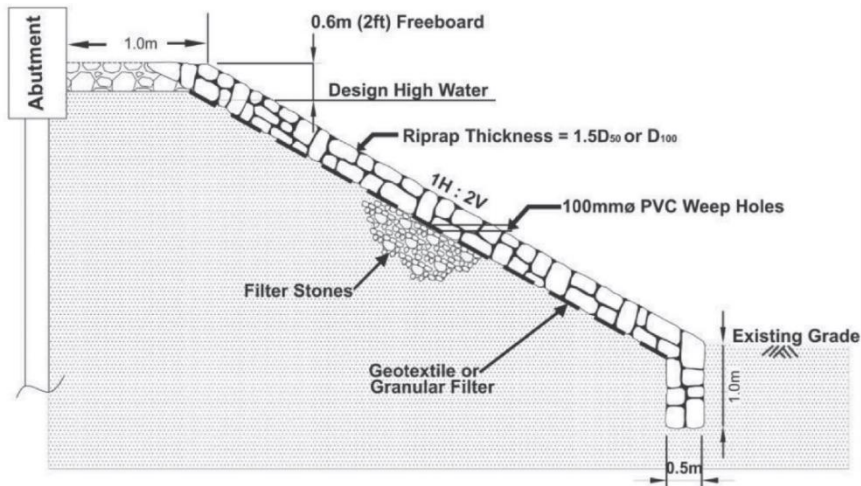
Example of Riverbed Protection (Typical Boulder Apron Layout)
